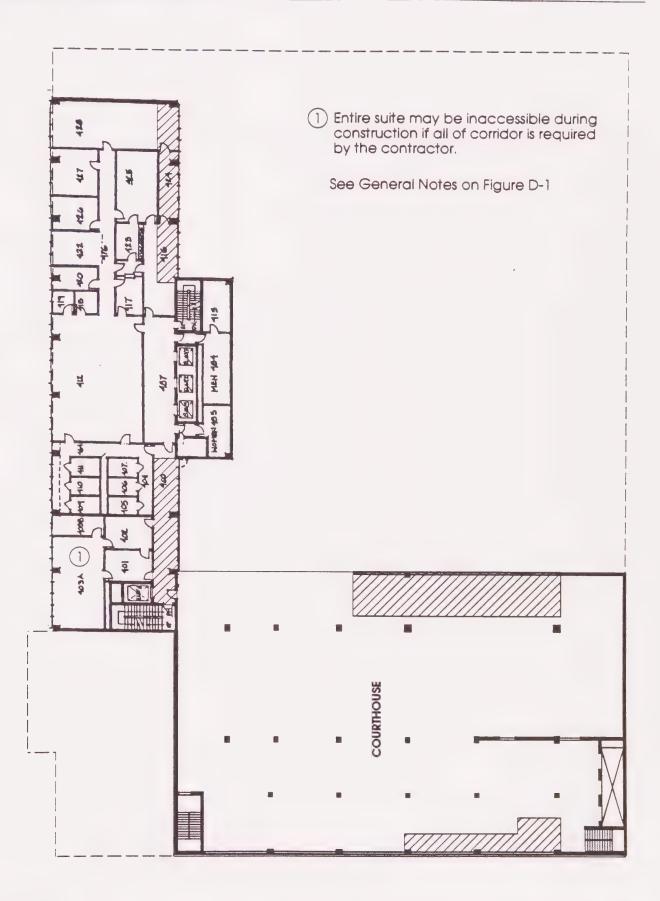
4th Floor Plan Showing Areas Impacted by Construction
